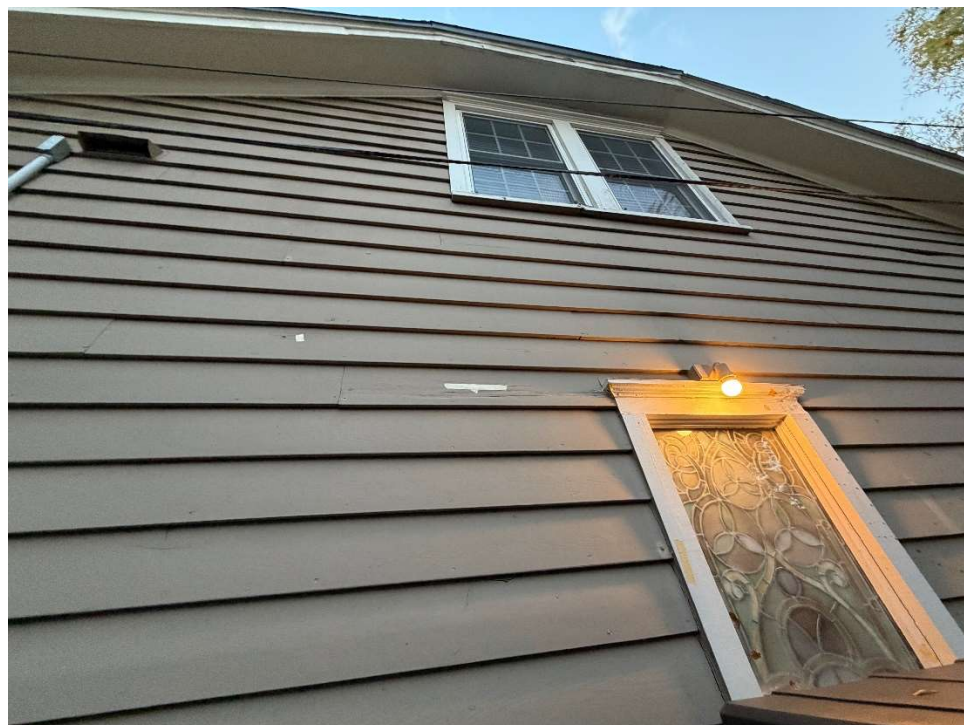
PHOTOS OF PROPERTY AND DAMAGED SIDING
